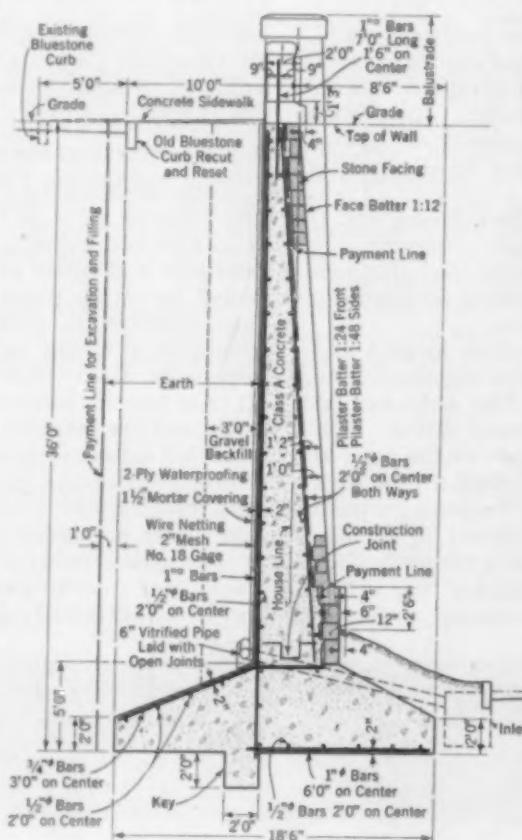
SECTION THROUGH THE CANTILEVER RETAINING WALL AT 233D STREET, NEW YORK, N.Y.
